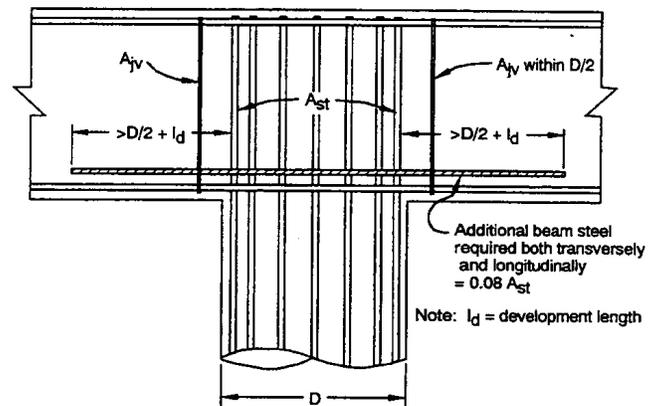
Additional cap beam bottom reinforcement for joint force transfer.
